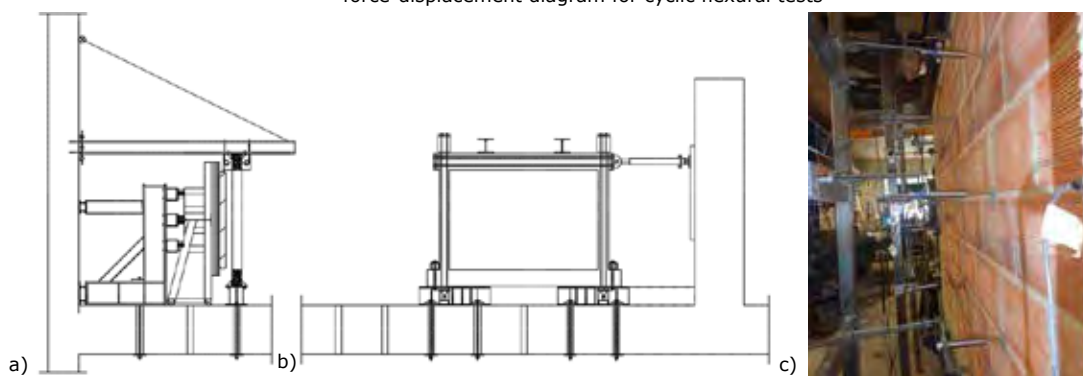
Tests setups for cyclic tests; (a) out-of-plane testing with airbags; (b) in-plane test setup; (c) instrumentation for measuring out-of-plane deformation of the brick masonry infill wall
